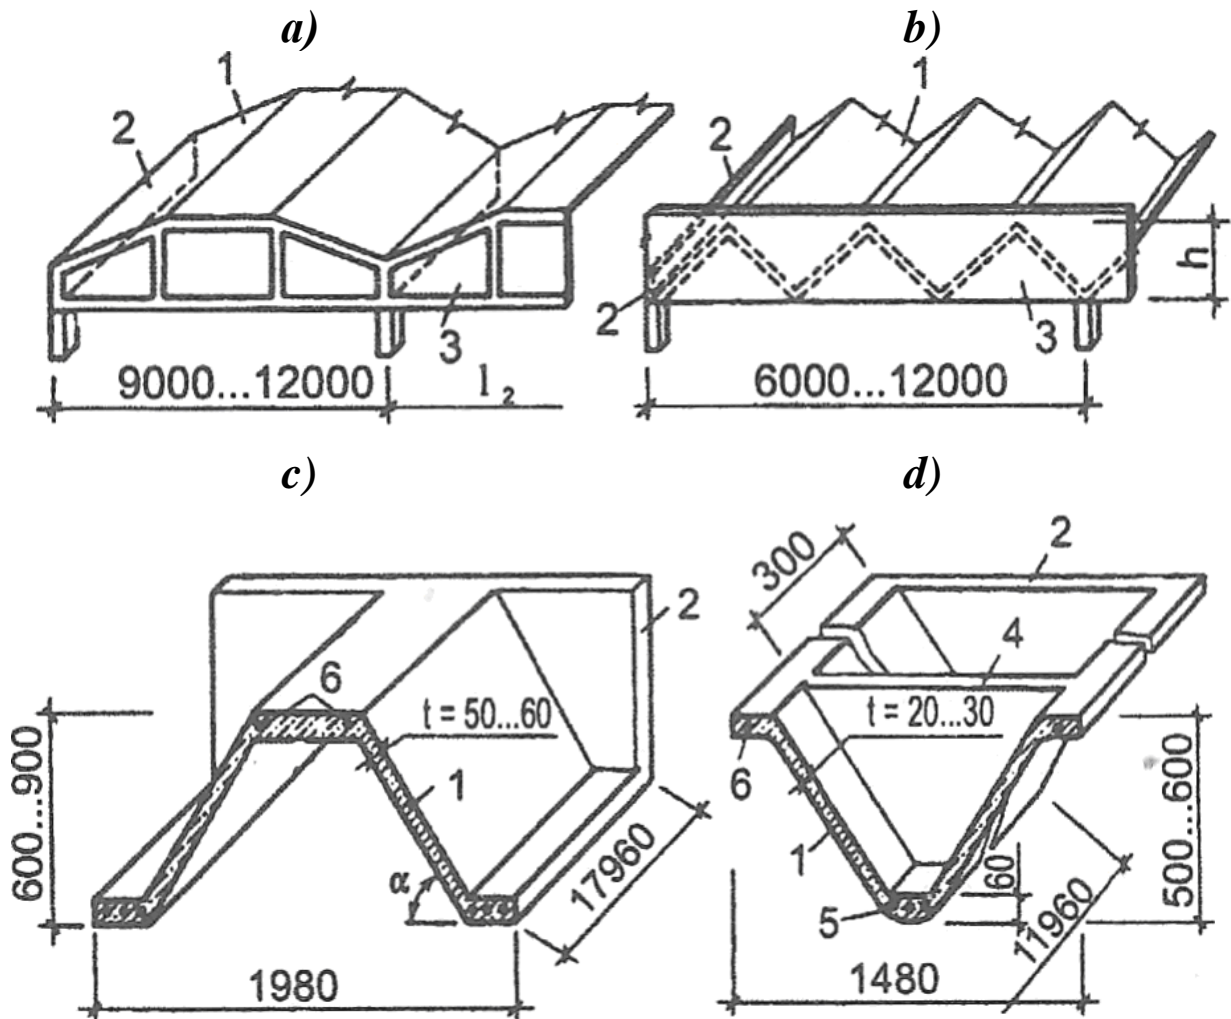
Scheme of a roofing with trapezoidal (a) and triangular (b) multi-wave folds made of precast long elements, as well as the structure of a large-sized reinforced concrete (c) and reinforced cement (d) fold:
